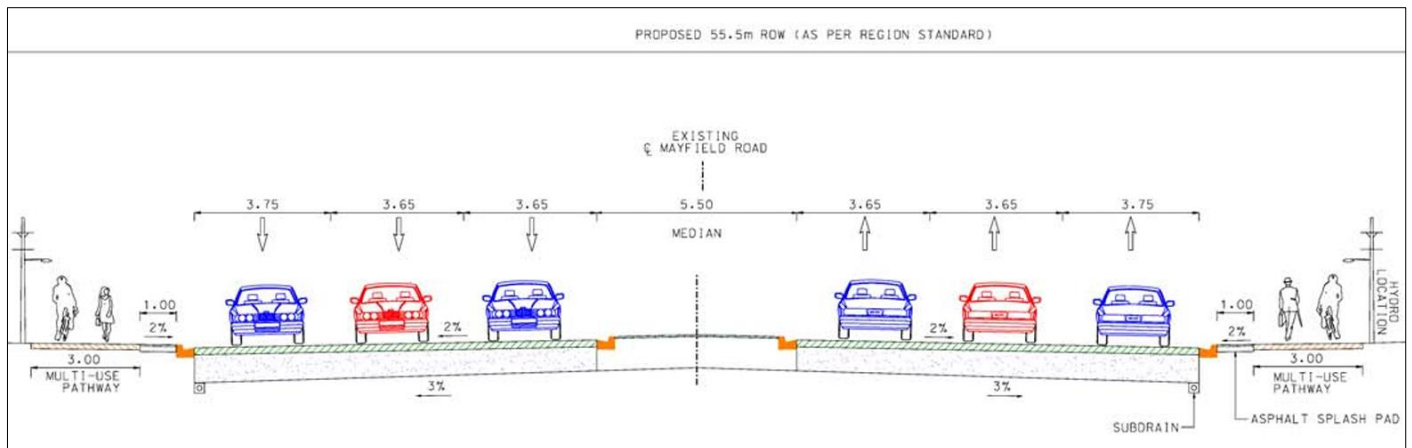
Mayfield Road Widening Cross-Section (Region of Peel)
